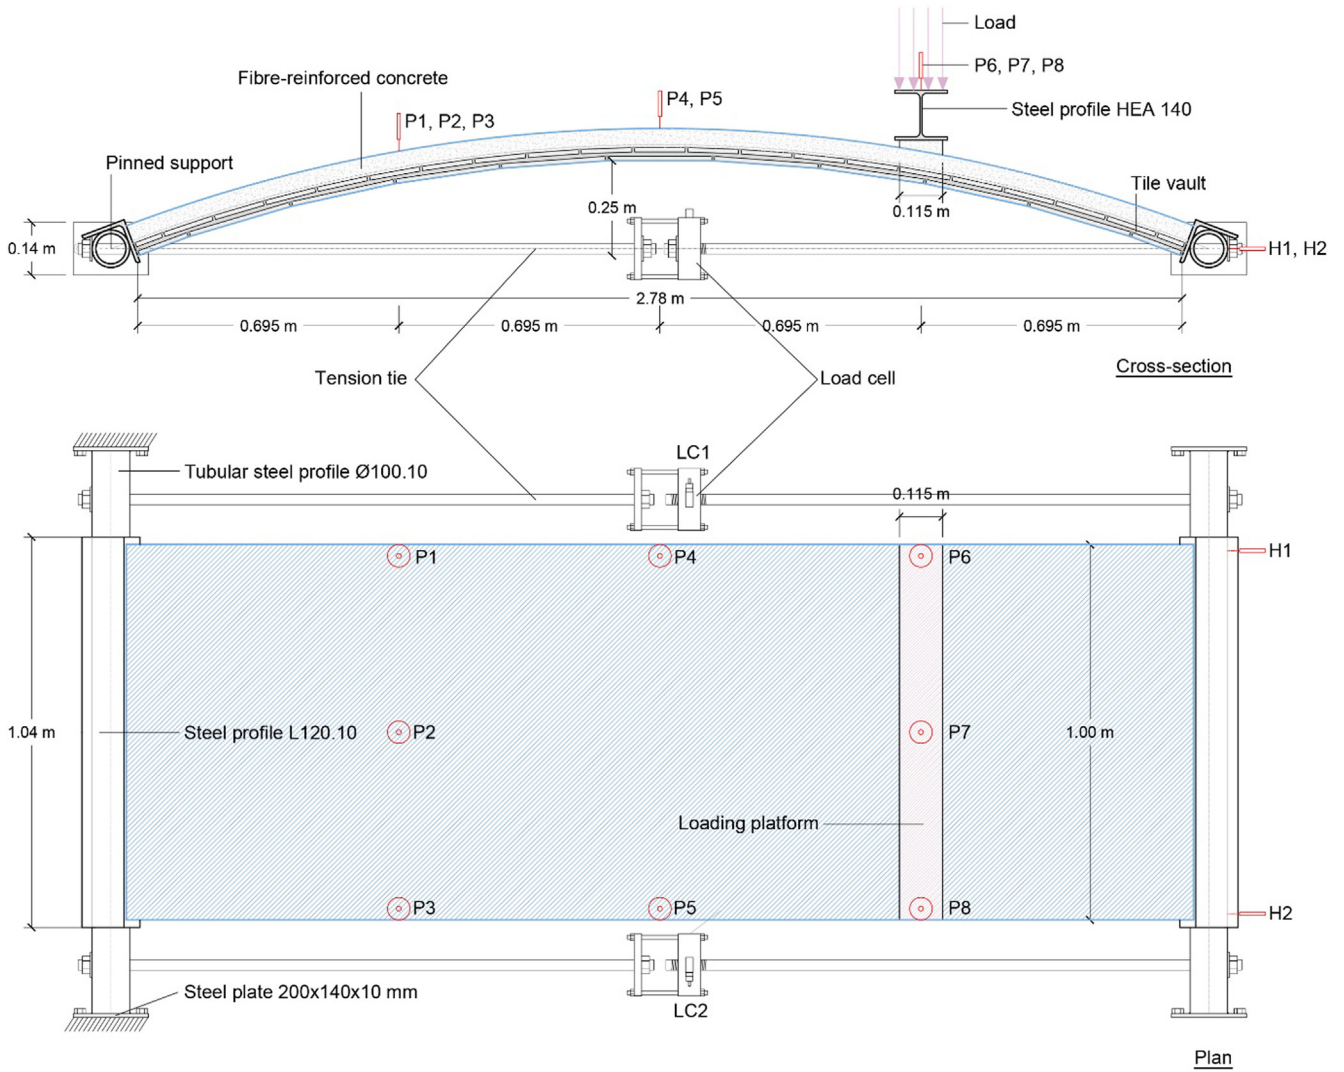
Setup of the monitoring and load test for the tile-concrete composite barrel vaults. Potentiometers indicated as P1 to P8, LVDTs indicated as H1 and H2 and load-cells indicated as LC1 and LC2. Up) cross section, down) plan.
